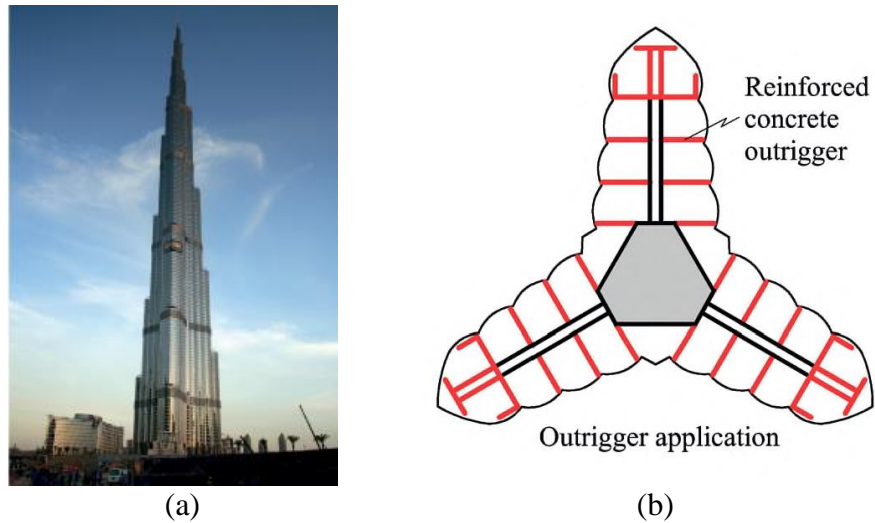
(a) Burj Khalifa (b) Structural Plan of Outrigger System
